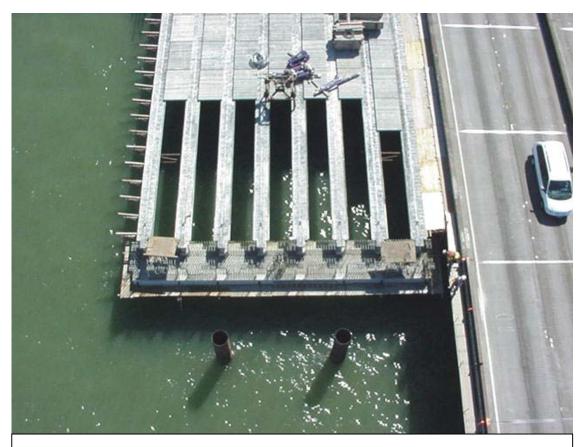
TOP VIEW OF PRE-CAST BRIDGE COMPONENTS.
